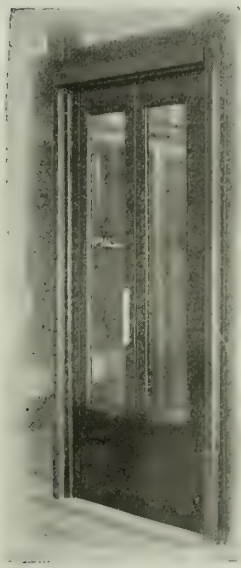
UNIVERSAL BALANCE DOOR IN CLOSED POSITION
